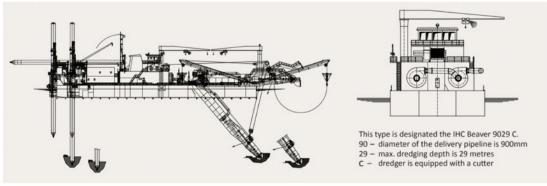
Schematic Layout of a Beaver 9029 C Cutter Suction Dredger
